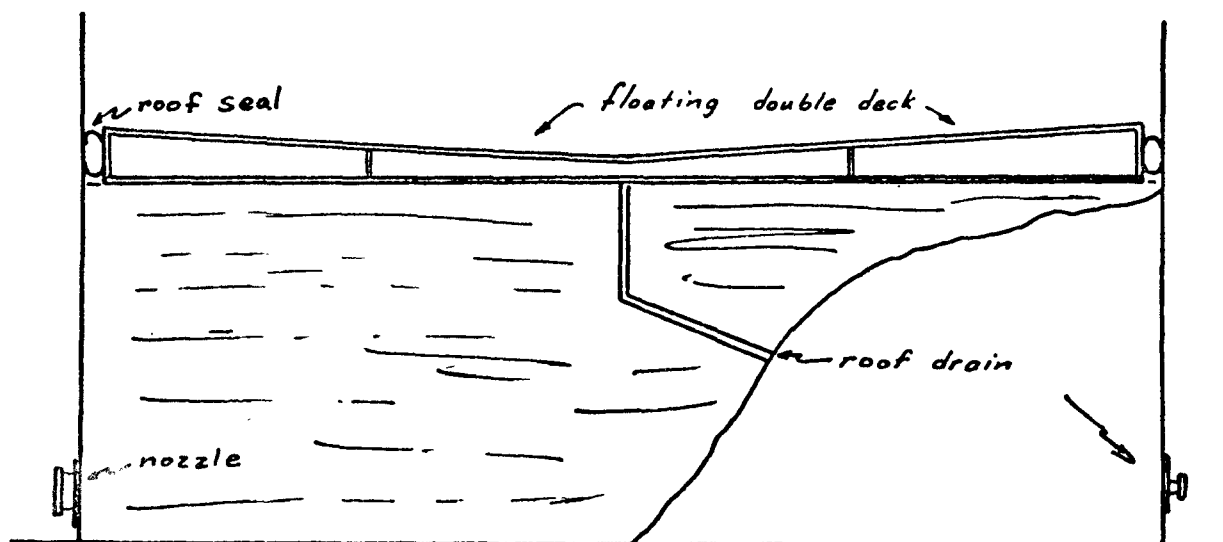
DOUBLE DECK FLOATING ROOF
